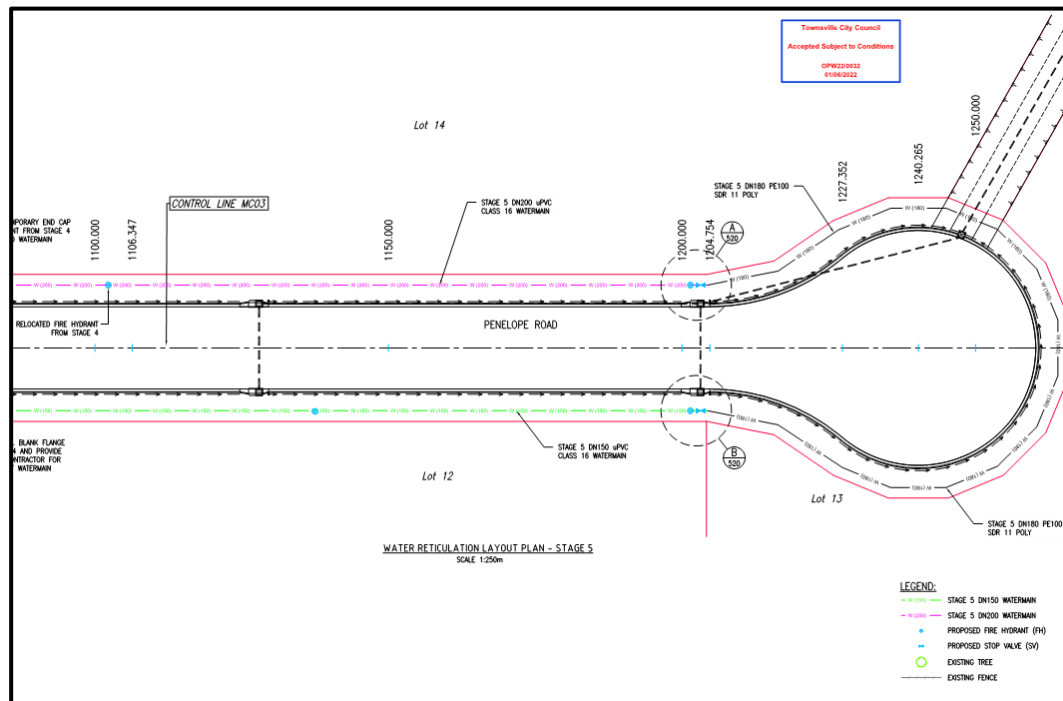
Cleveland Bay Industrial Estate Stage 5 - Water Reticulation Plans by Langtree Consulting (Extract)
